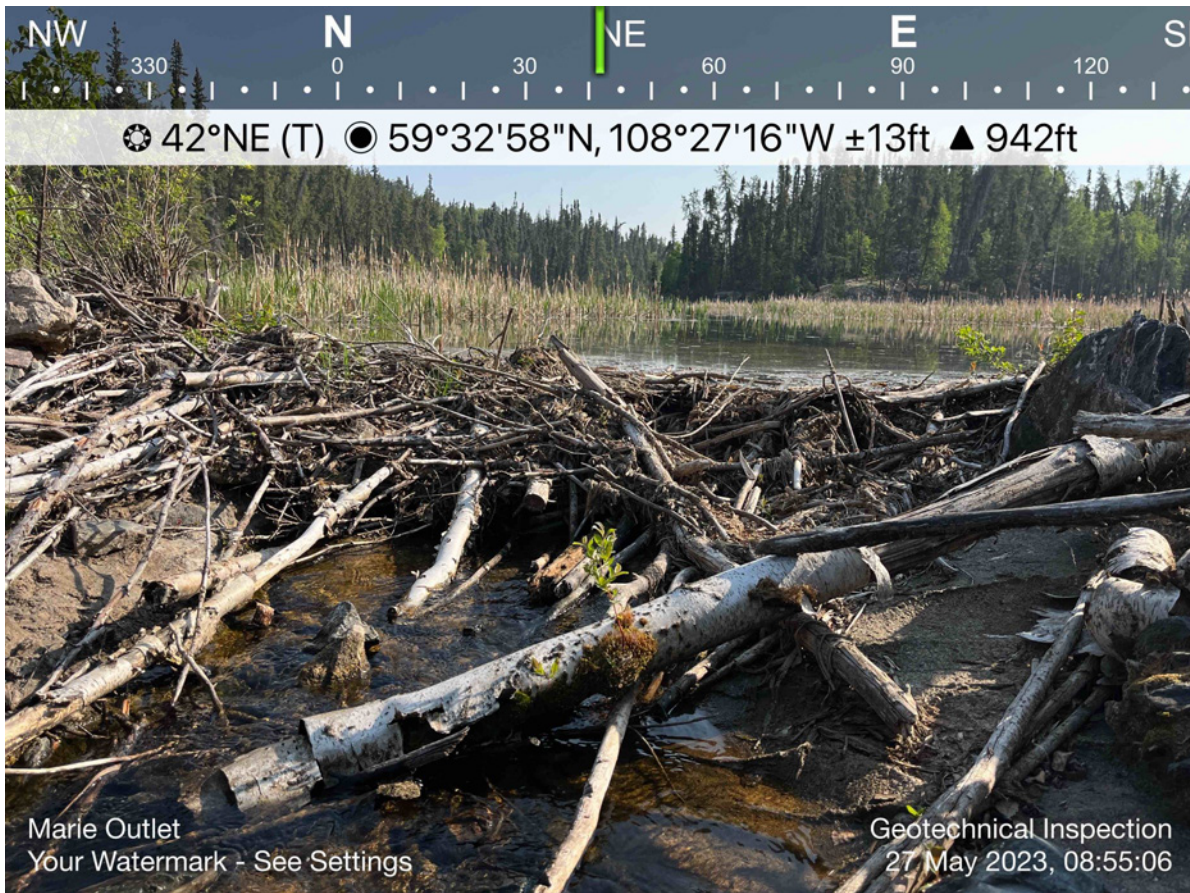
Marie Reservoir Spillway inlet; beaver dam first noted in 2018
